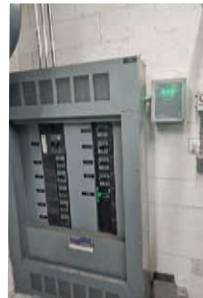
Surge protector installed at elevator distribution panel feeding various building pumps.
